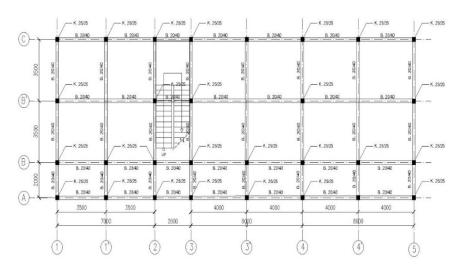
Floor plan of columns and building blocks TK A Source : Personal document image
